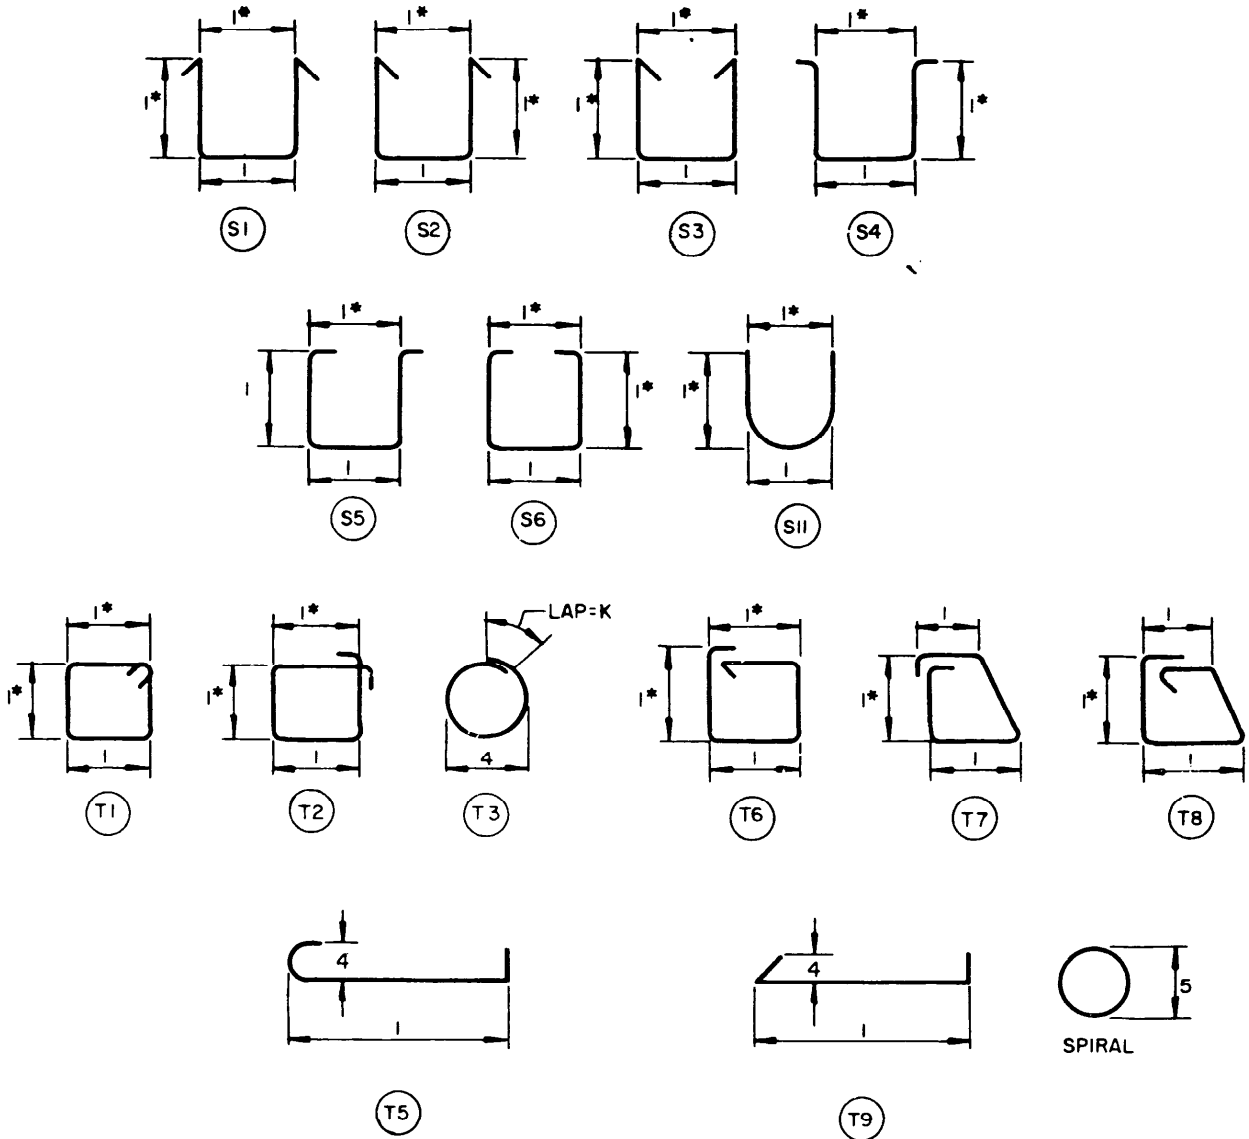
(a) - Standard fabricating tolerances for bar sizes #3 through #11
